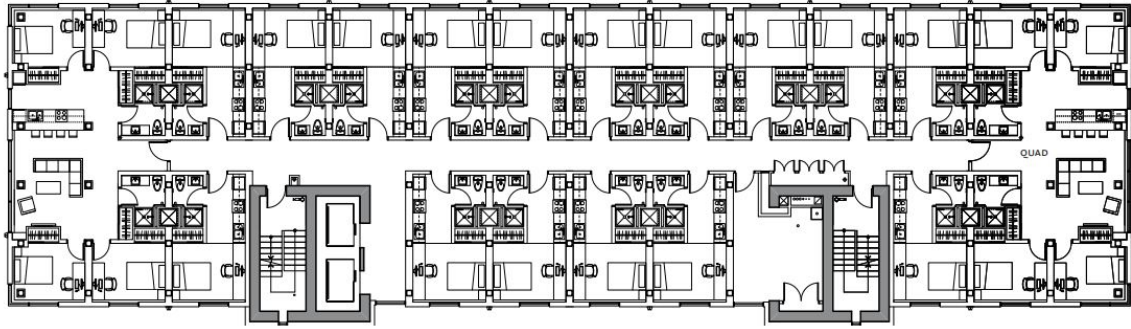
Floorplan of the Brock Commons Tallwood House [45]
